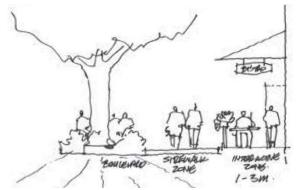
Fairfield Neighbourhood Plan - Illustrative
